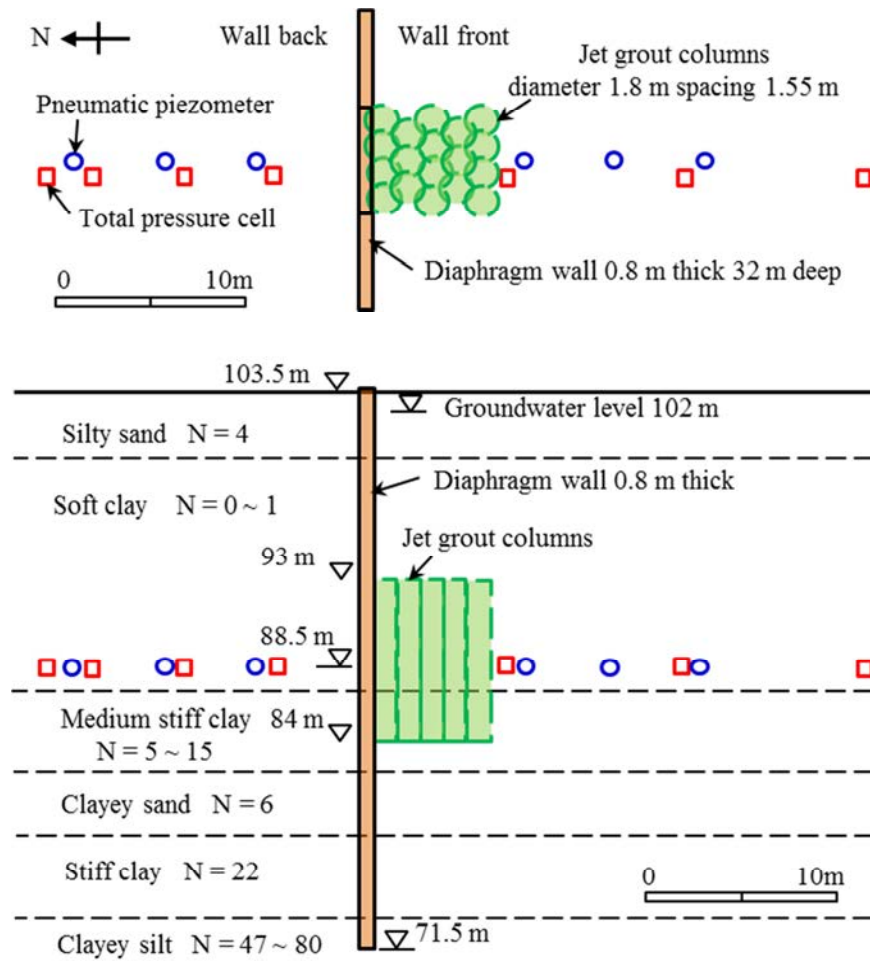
Plan and Section for Jet Grout Columns, Pressure Cells and Piezometers - Case 2
